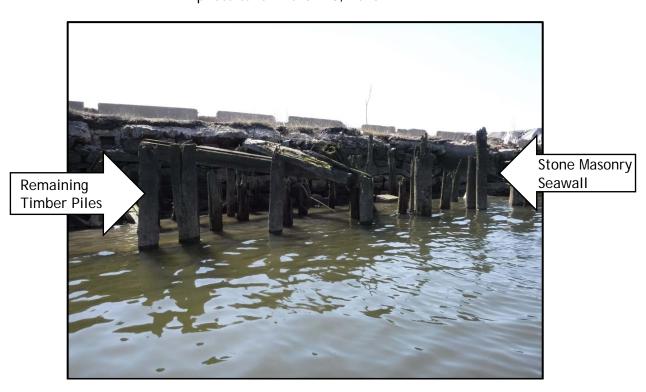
Stone masonry seawall along Gateway Terminal, looking southwest, photo taken April 14, 2016.
